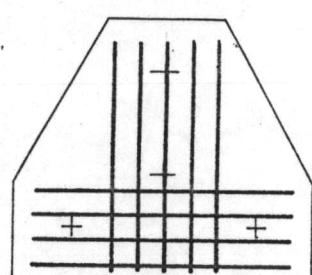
Equivalent Transformed Section of Concrete Subjected to Tension Based on Truss Analogy at Cracking and Ultimate Conditions
